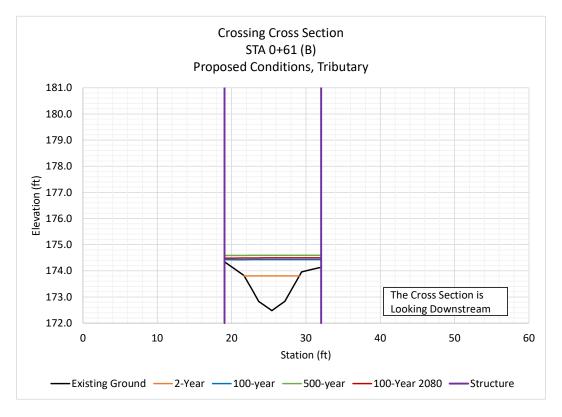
Typical section within proposed structure (facing downstream), tributary only
